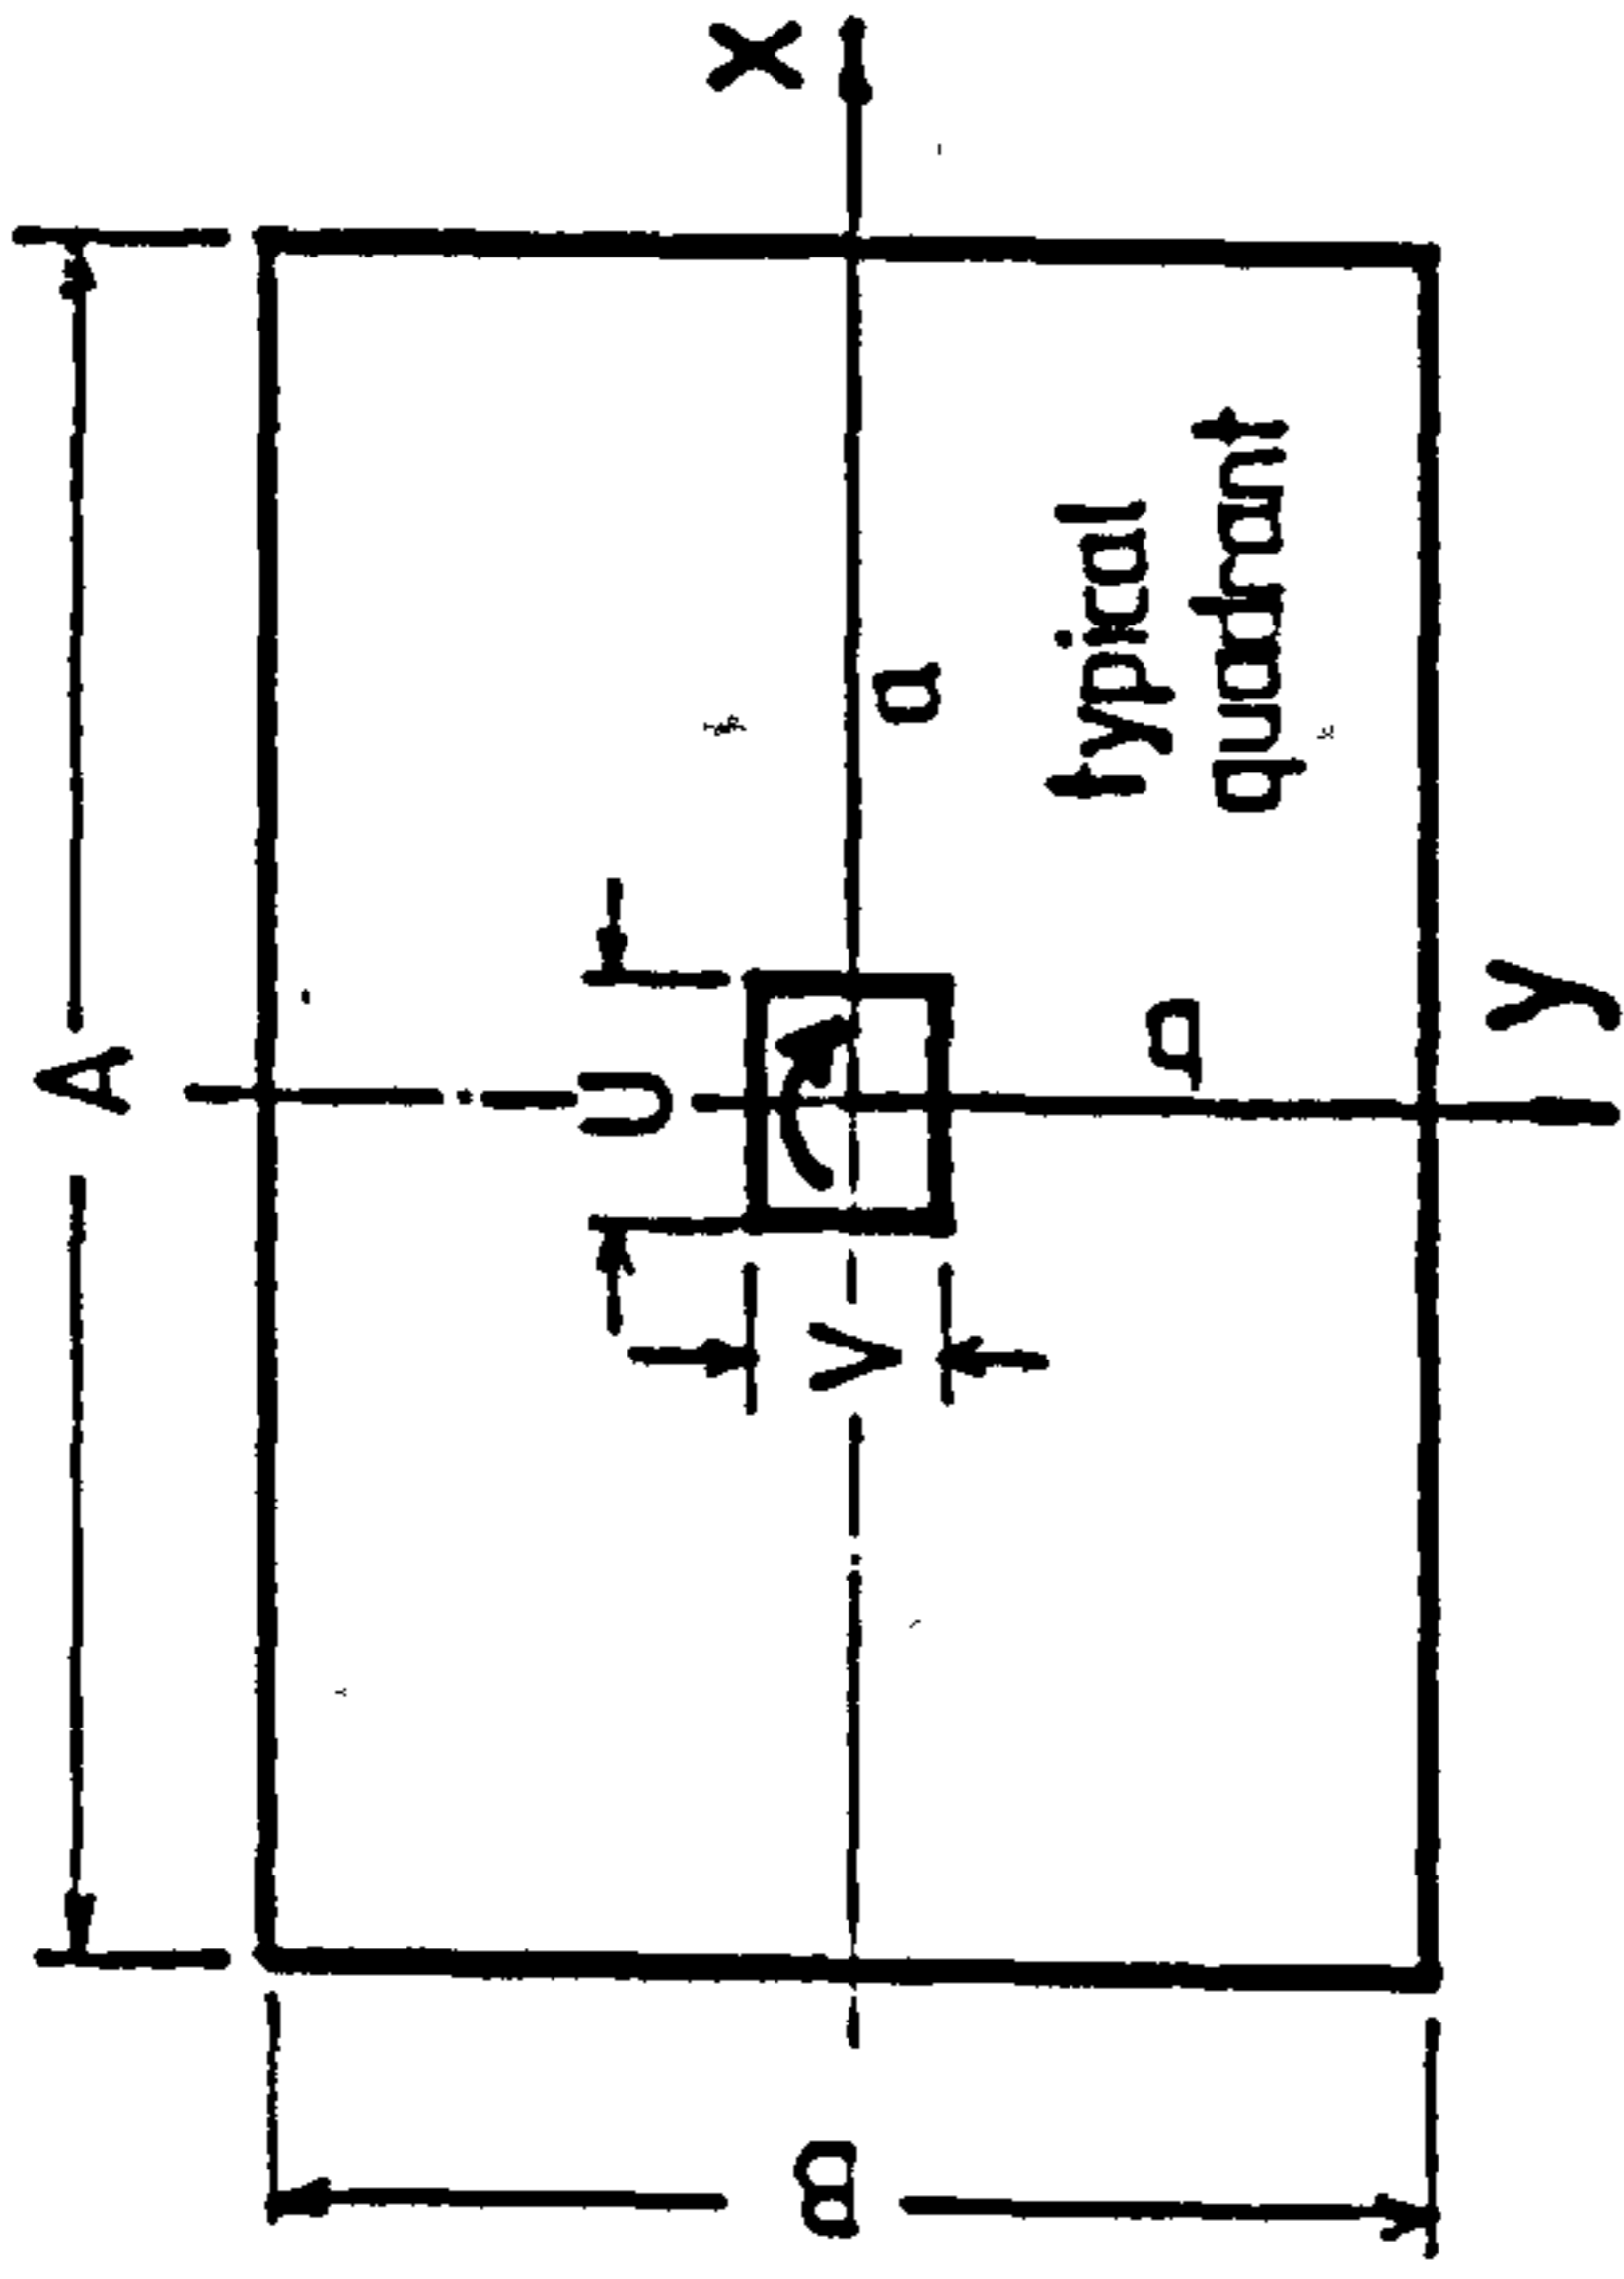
TYPICAL INTERIOR FLOOR PANEL
